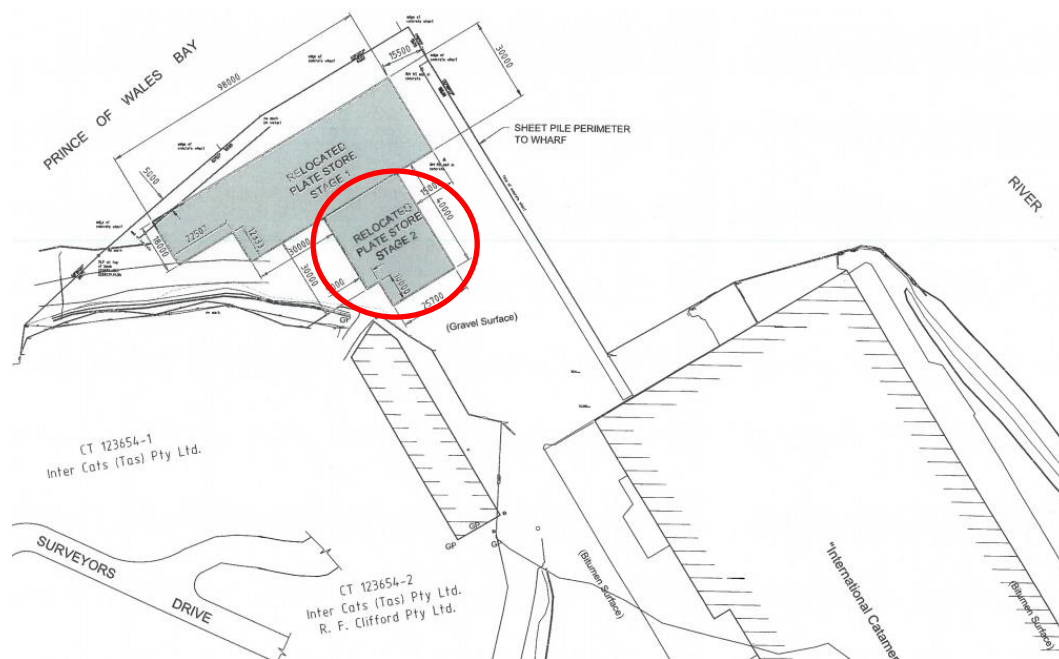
Proposed site plan (Proposed Stage 2 extension subject to assessment is encircled; Stage 1 previously approved under PLN-19-264 and PLN-19-264.01)
